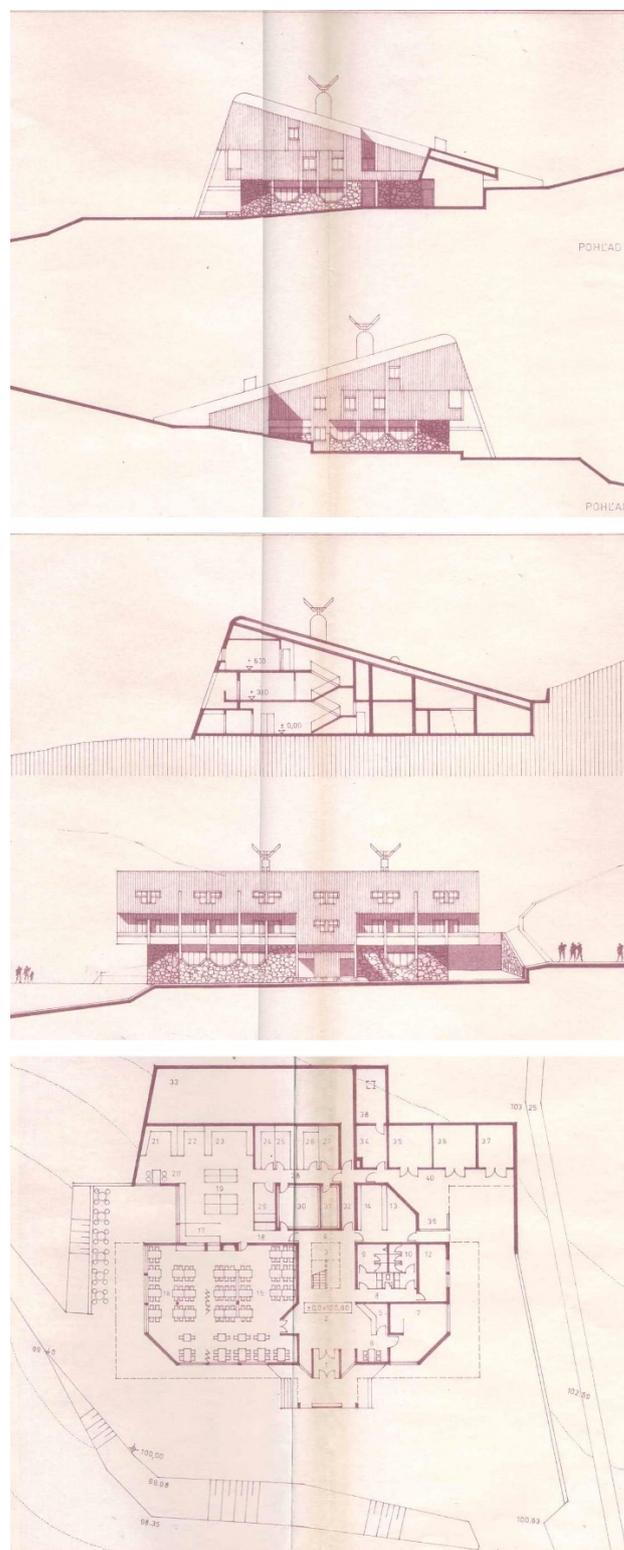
Kežmarská chata proposal, 1984. Authors: Ludovít Jendreják, Ján Šilinger, and Olga Babjaková, ŠPTÚ Bratislava. Top to bottom: east elevation, west elevation, cross-section, south elevation, plan of the first floor. (Source: Legutky, 1984)
